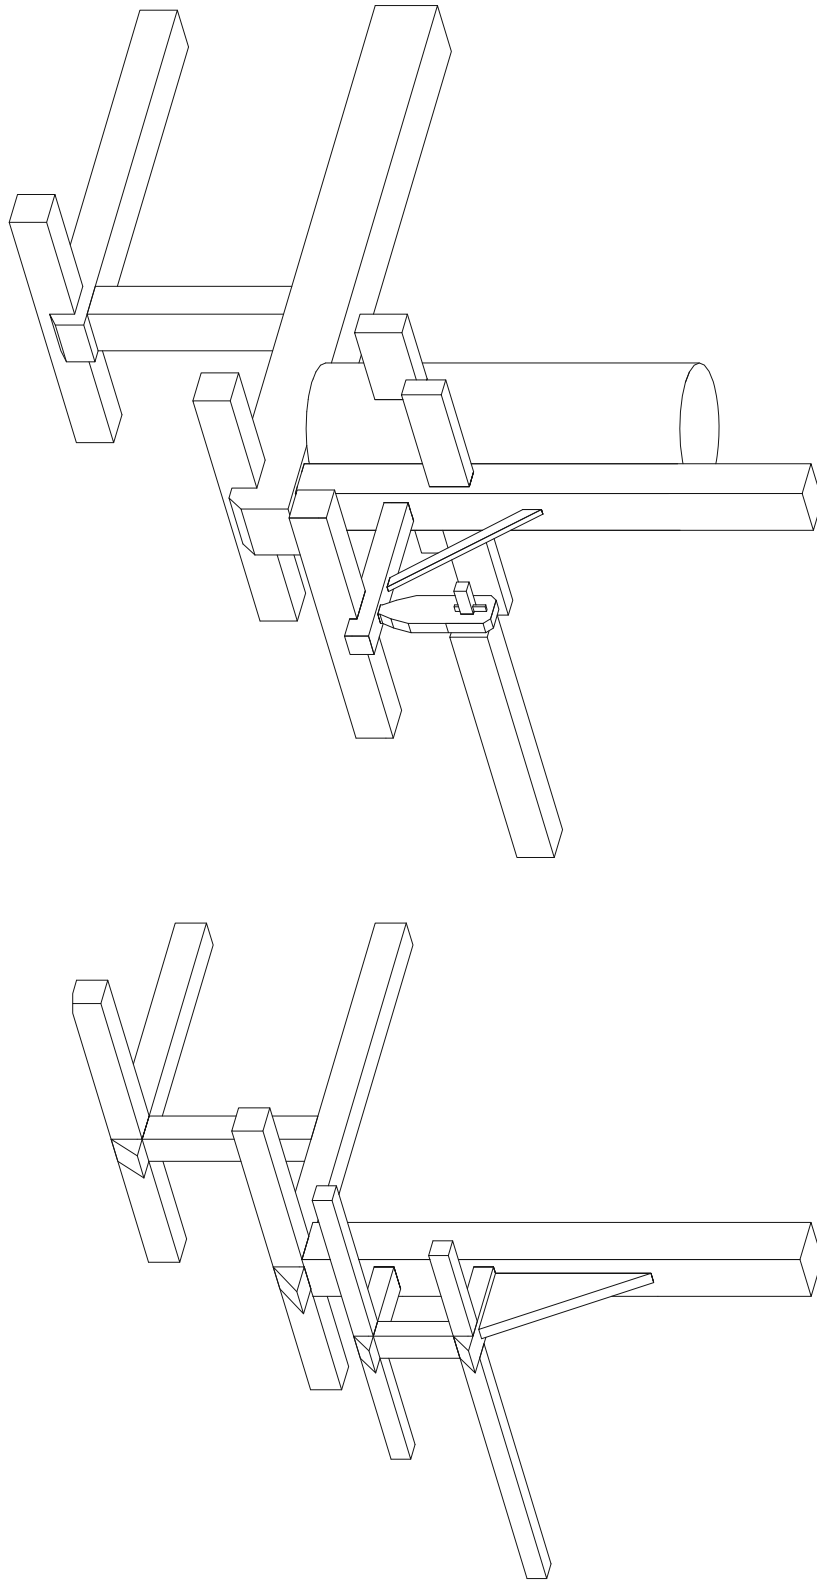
Map: assembling techniques: purlin, crosswise beam, and pillar
